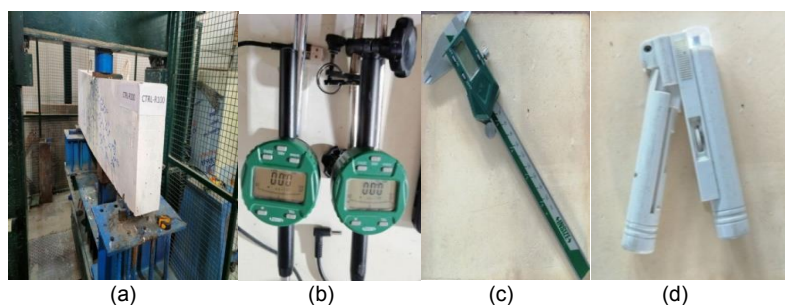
(a) Loading machine, (b) dial gauge, (c) Vernia, (d) Crack meter.
